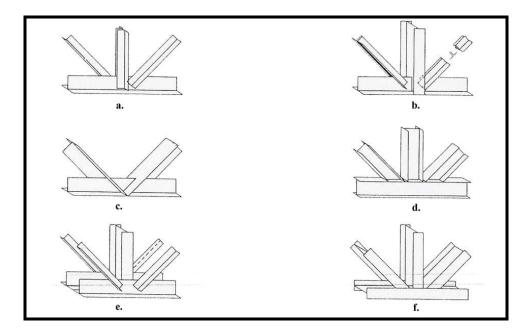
Connections for simple welded trusses (Ellison, 1987:211).
